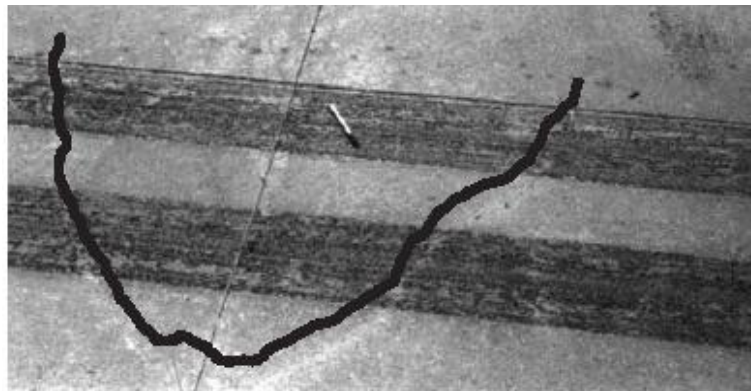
Typical UTW corner cracking at the FHWA ALF.
